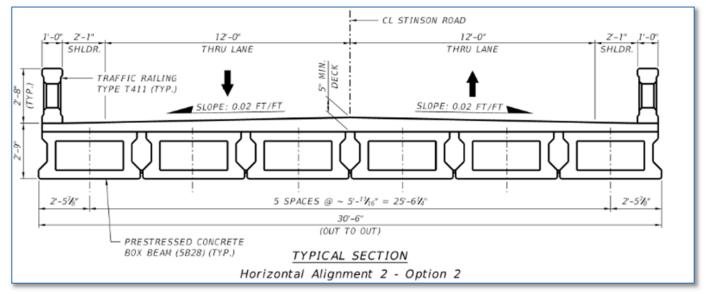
TxDOT Prestressed Concrete Box Beams (5B28) Typical Section
